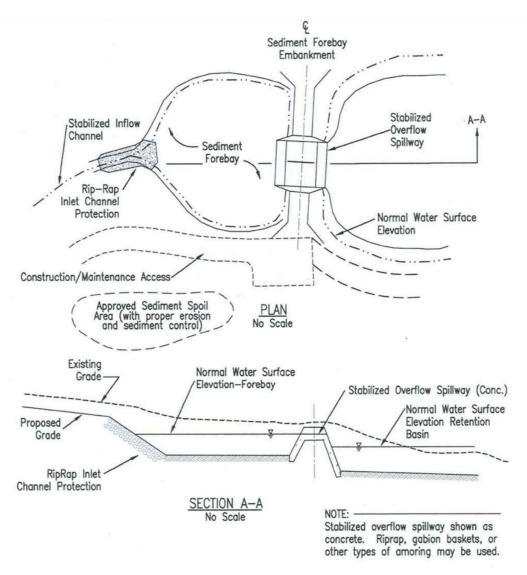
Typical sediment forebay plan and profile (Figure C3-S11-3 ISWMM).
